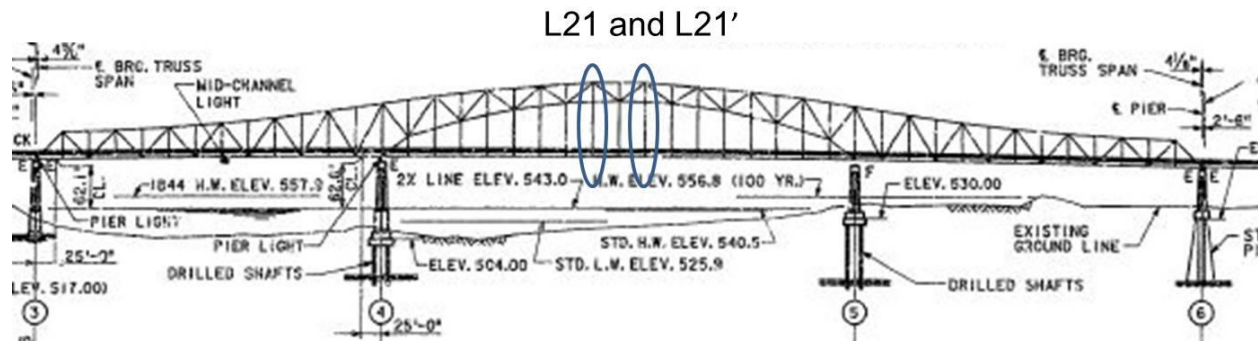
Elevation view of bridge A4497 showing the location of vertical members L21 and L21'
